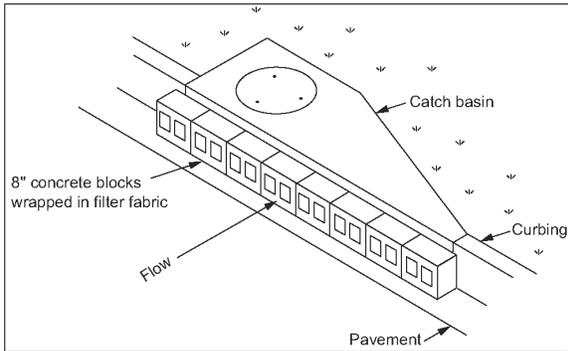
Curb Inlet Filter Installation Requirements (Sd2-P)
